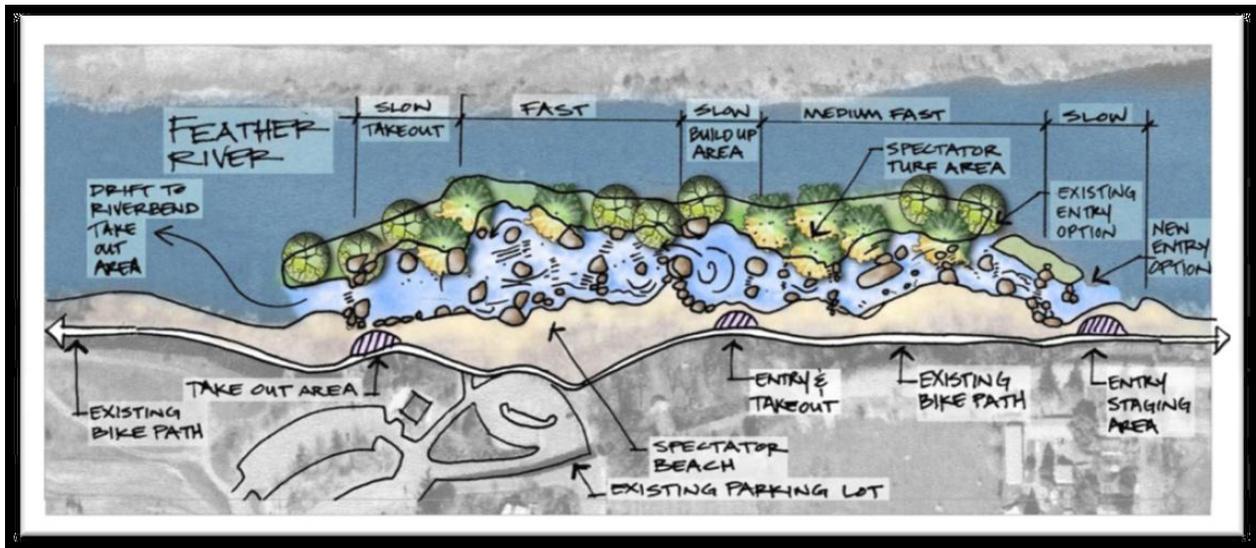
Bedrock Park whitewater facility conceptual site plan presented in the FRRPD 2020 Master Plan.
